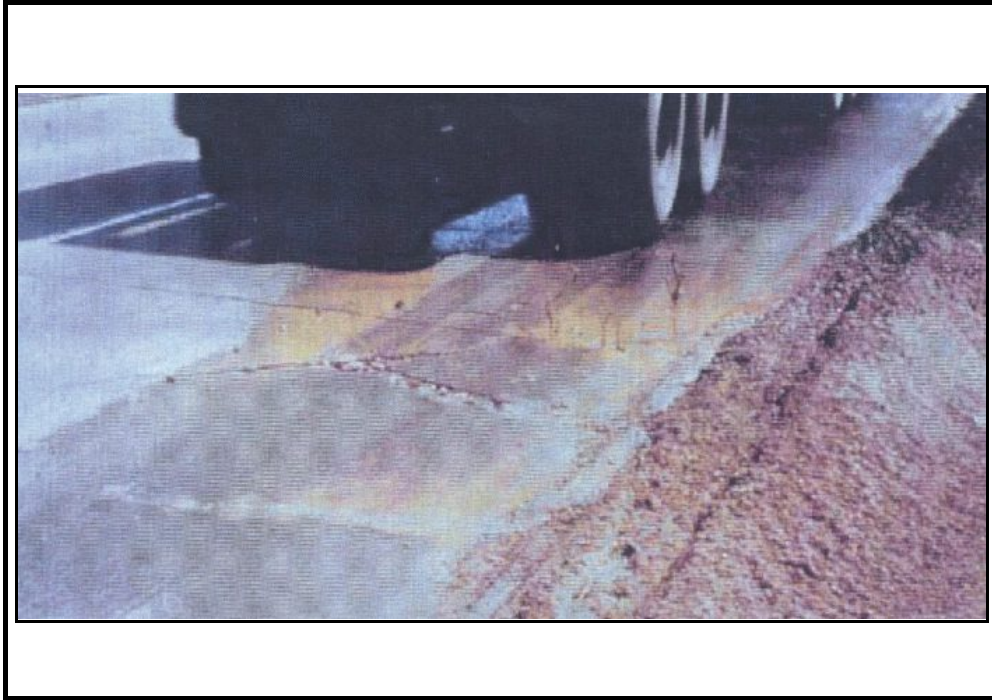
Pumping in Jointed Concrete Pavement, High Severity
